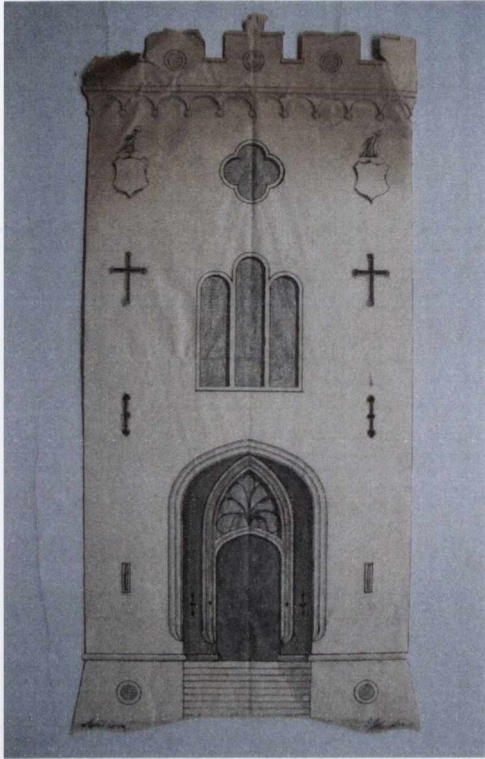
Birr Castle, elevation of proposed gatehouse tower, signed J. Johnston, April, 1803, Rosse papers, O/19/2.
